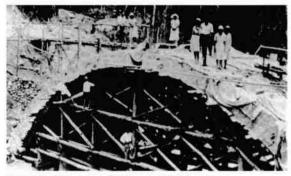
Construction of bridge over Little Crystal Creek Source: City Libraries Townsville, Local History Collection No. 5701.
